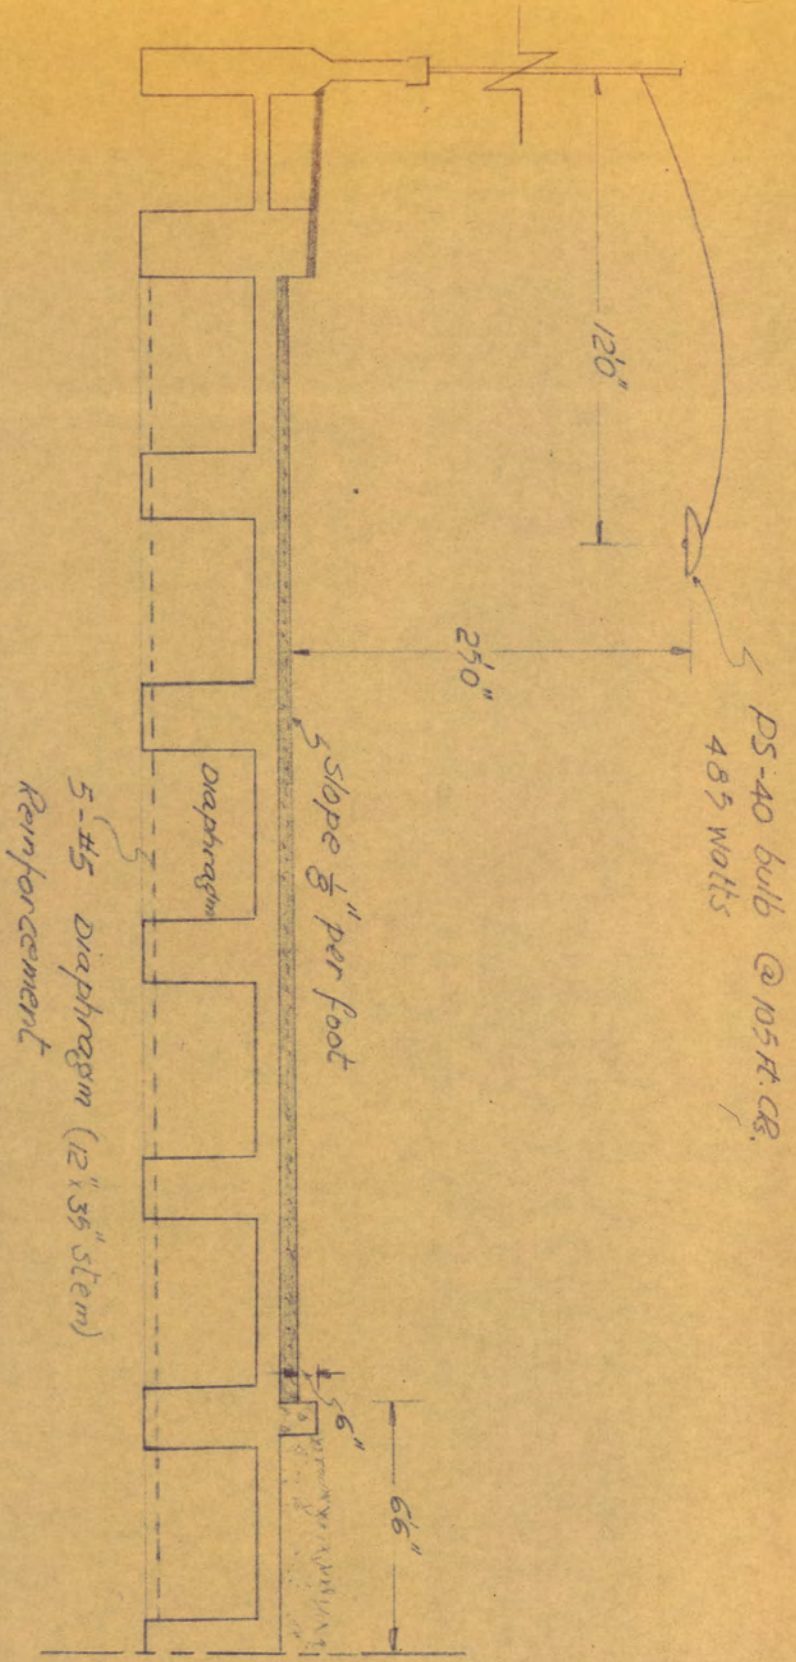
Details of median strip, Drainage, Diaphragm, and Illumination.
